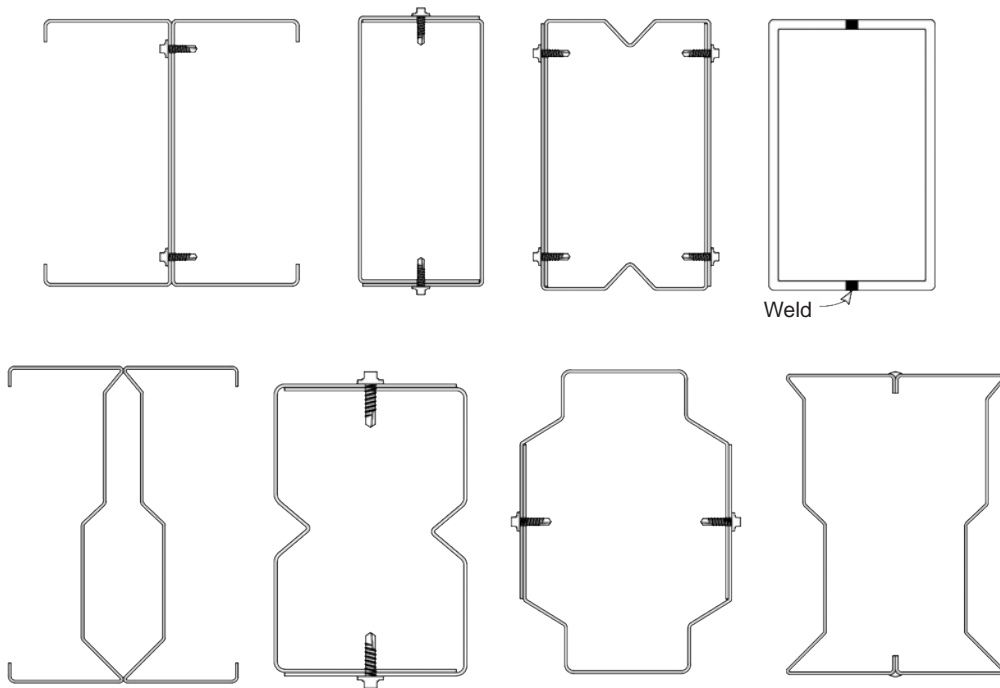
Cold-formed steel structural members, built-up cross sections
